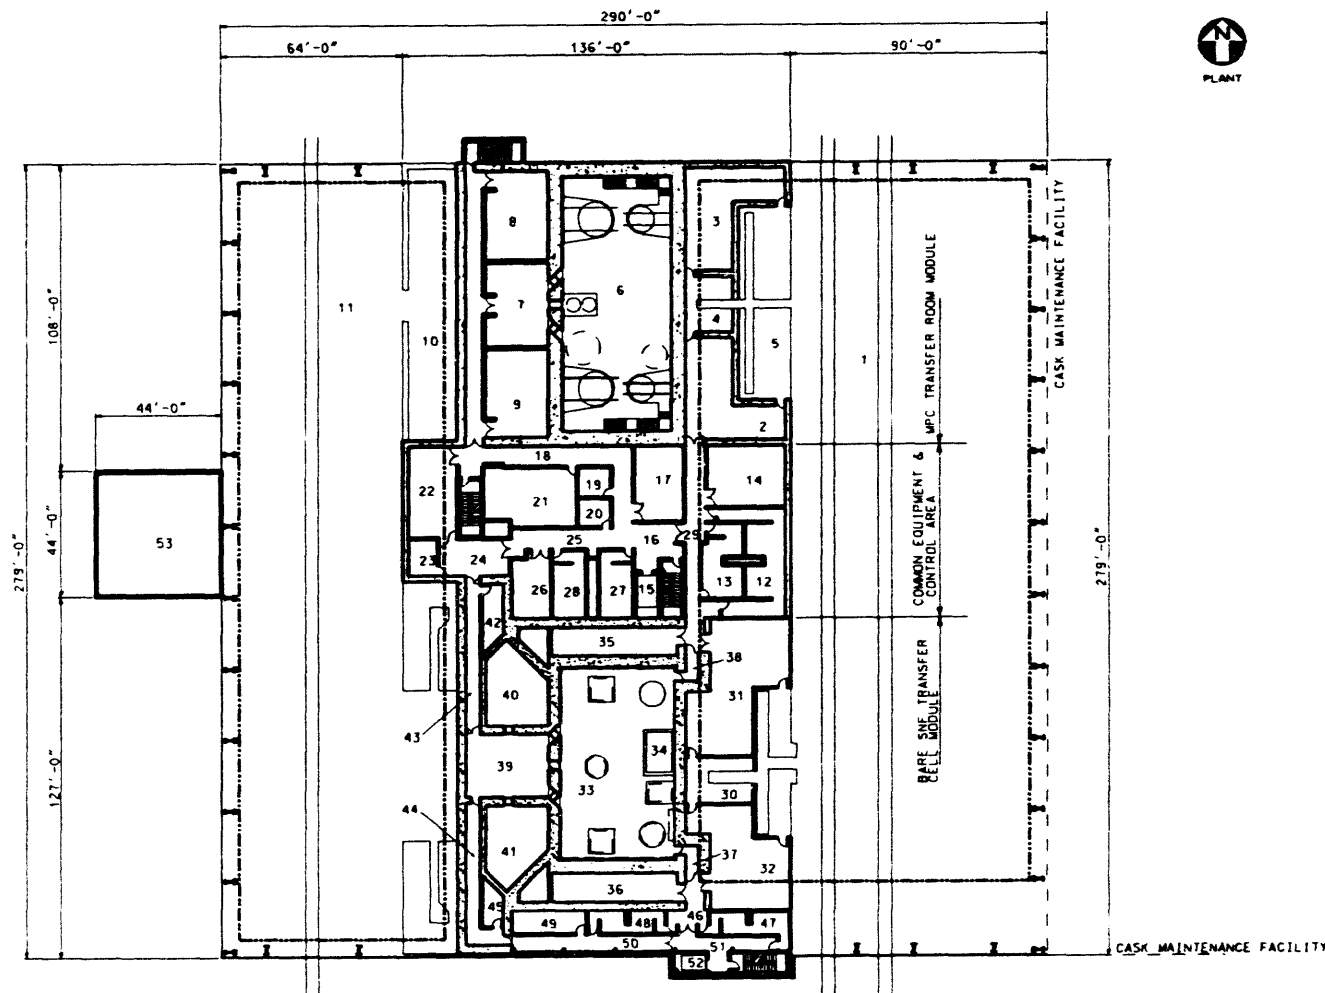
General Arrangement Plan at Ground Floor of MRS/MPC Transfer Facility
